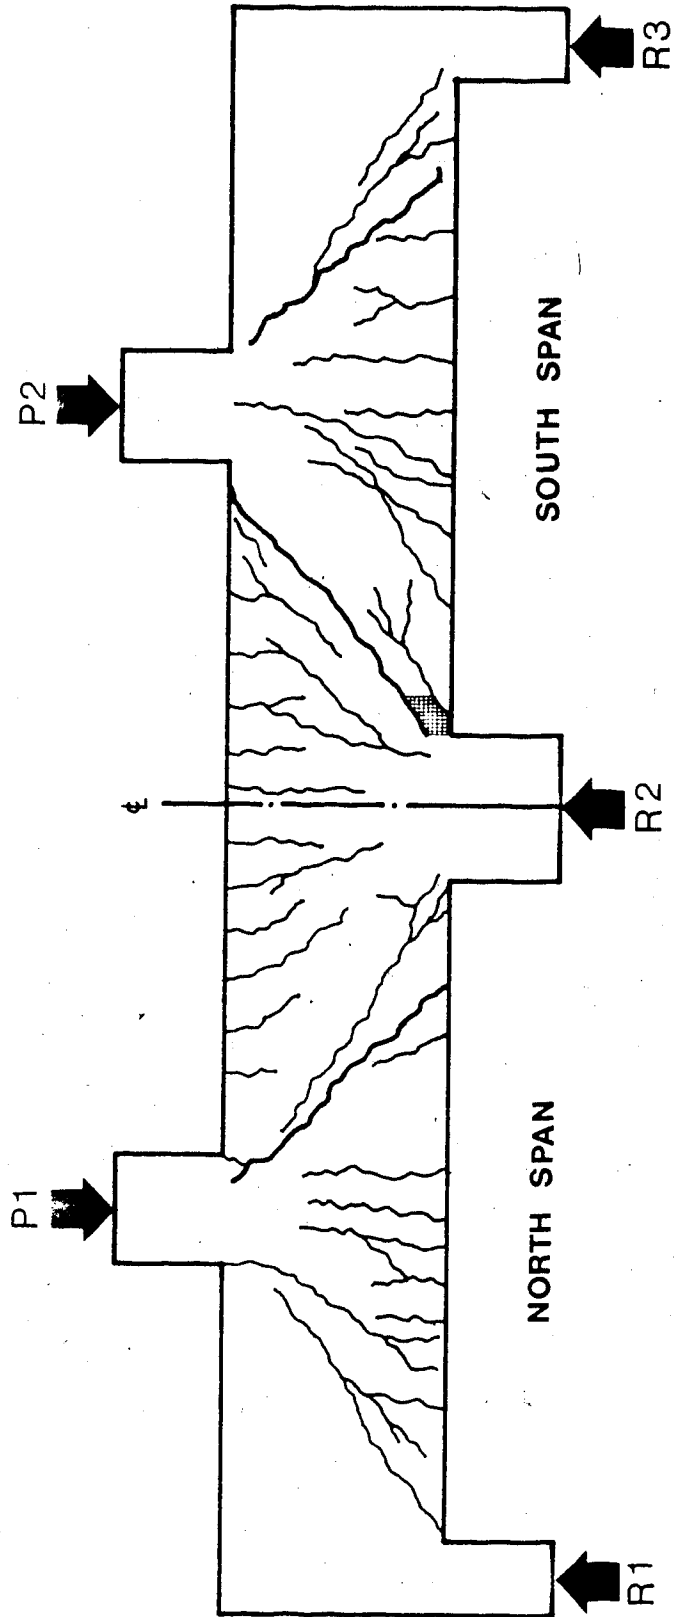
Failure Cracking Pattern of Beam No. 1
